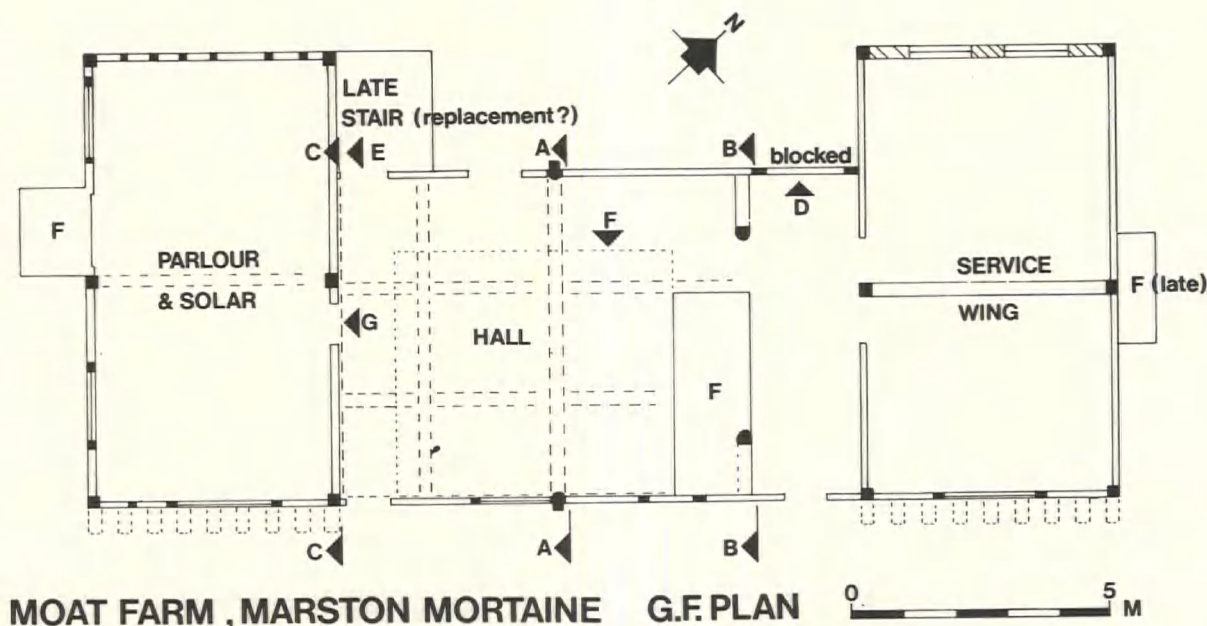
Moat Farm, Marston Mortaine. Ground Floor Plan. The modern partitions in the hall are shown by short dash lines. Existing wall studs are shown, but apart from the principal posts, most are not original. A-C refer to sections. D-F refer to door head elevations.
